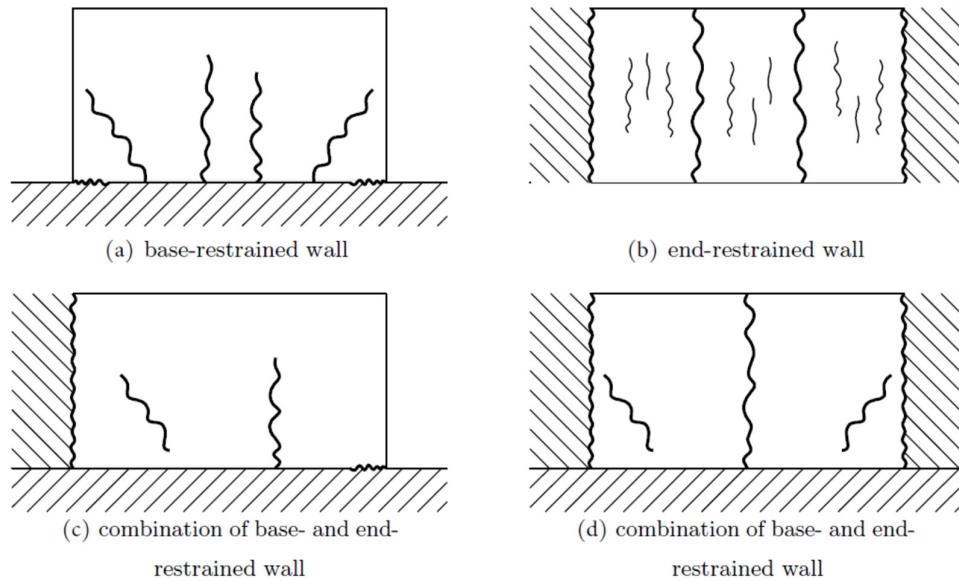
Typical cracking patterns in early-age reinforced concrete walls [Klemczak, et al, 2011]
